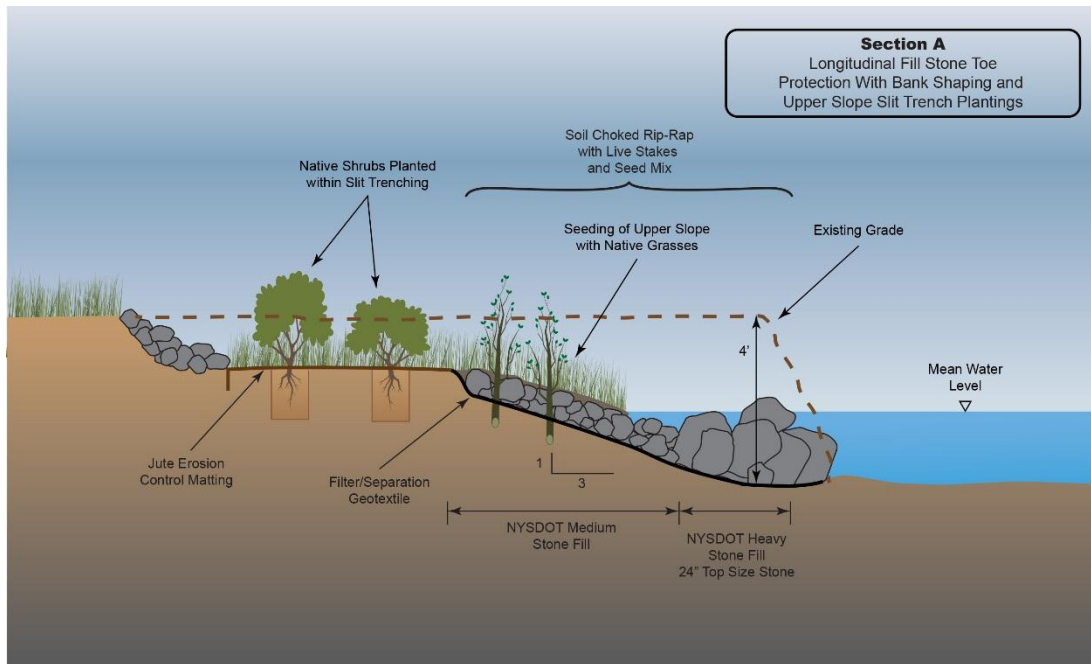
General Cross Section A - Longitudinal Stone Toe Protection with Bank Shaping and Slit Trench Plantings (Reach 1)
